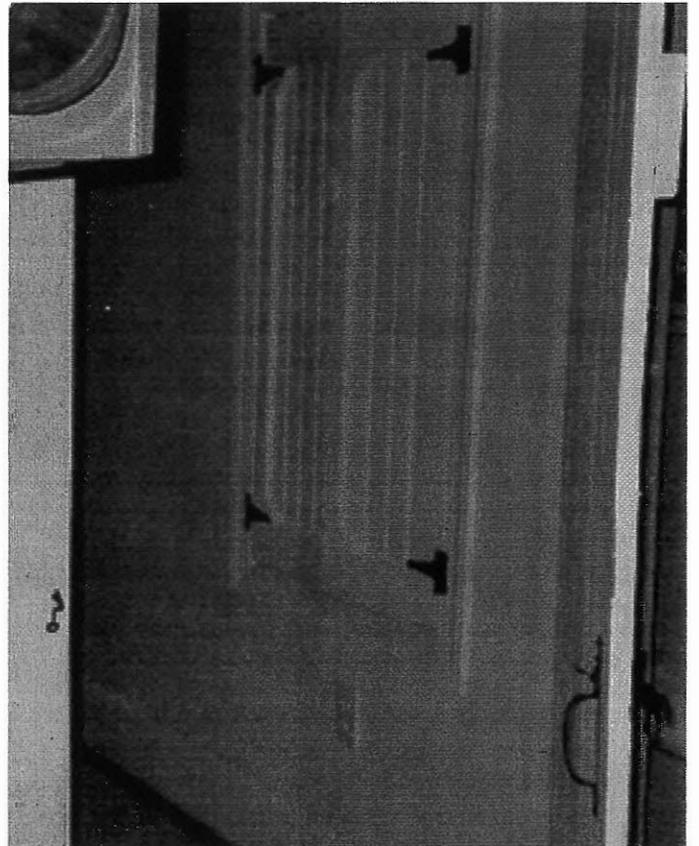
Hinged cupboard with panels next to door to open to back room, street side, cellar.
